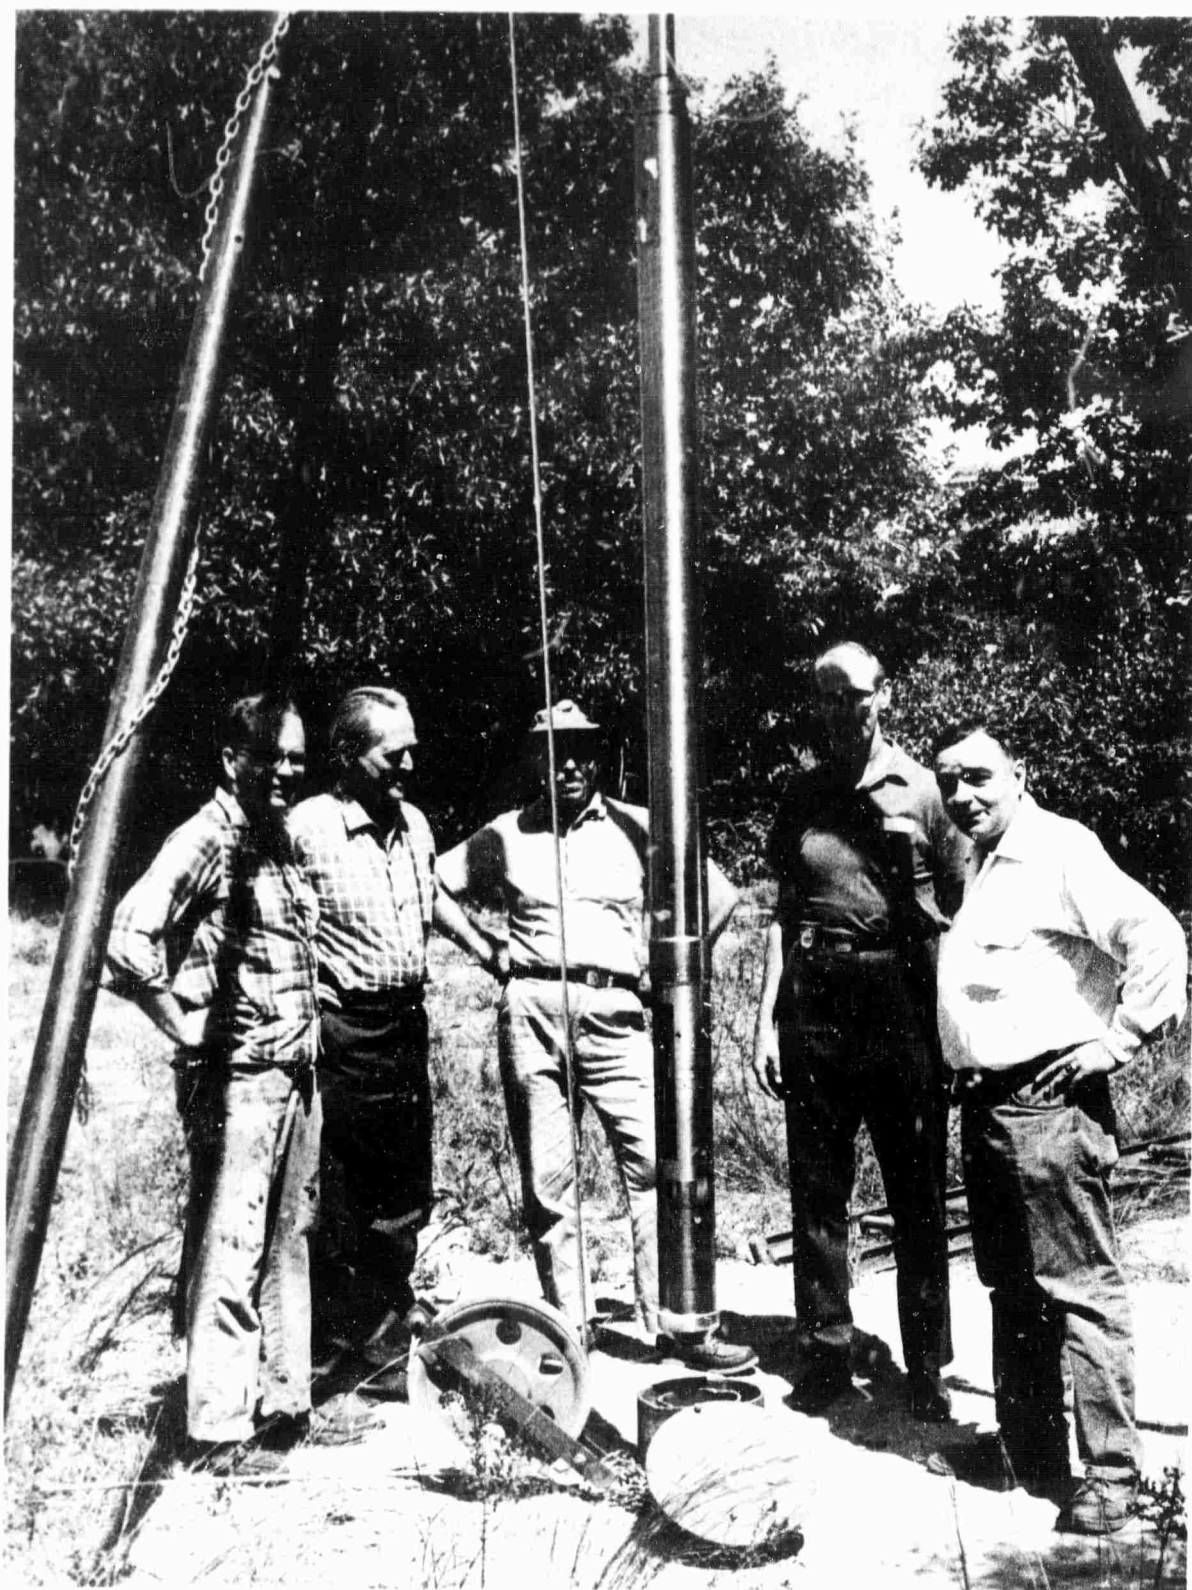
Deep-Hole Package Being Installed in the Test Borehole
